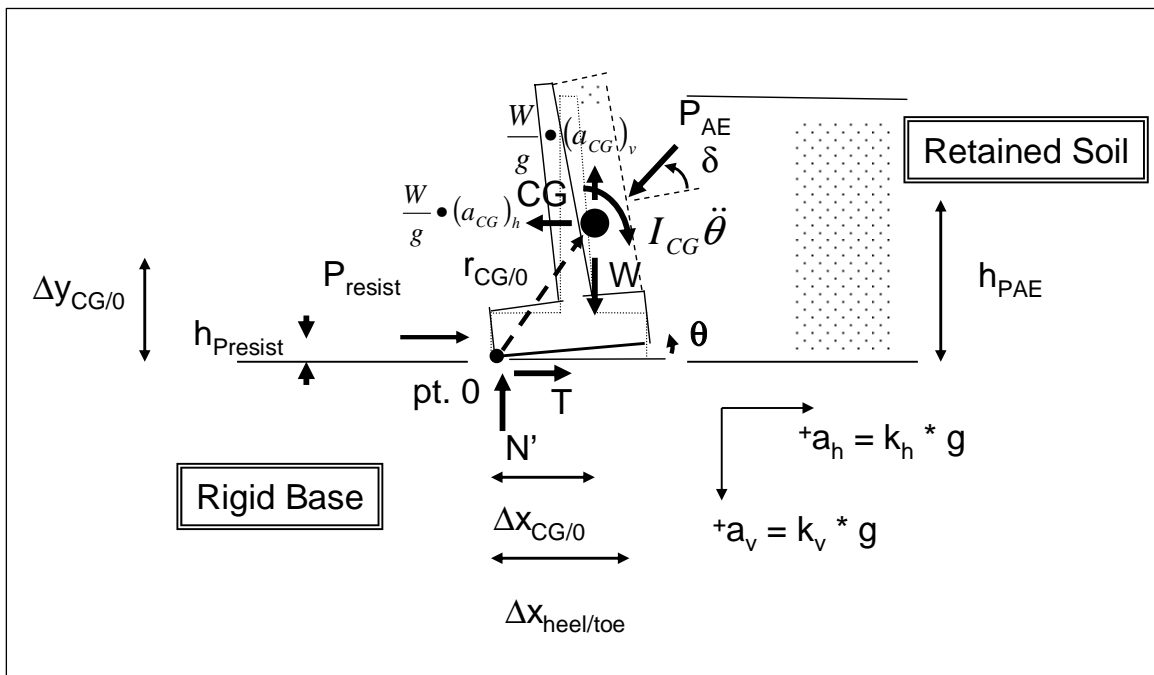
Inertia forces and resultant force vectors acting on a rigid block model of a cantilever wall retaining moist backfill with rotation about the toe of the wall during horizontal and vertical shaking of the rigid level base.
